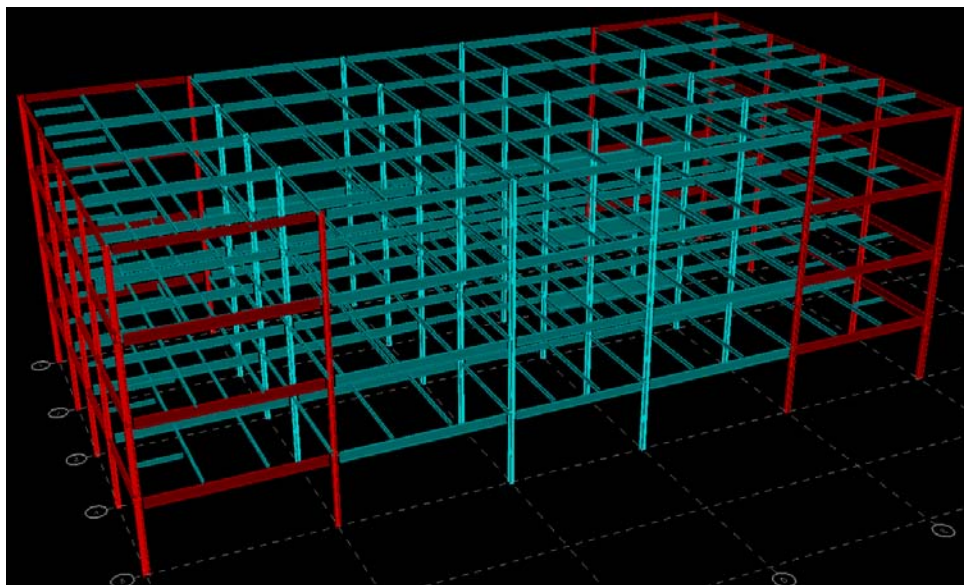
Moment Frame Layout: Gravity Structure in Blue, Moment Frames in Red
